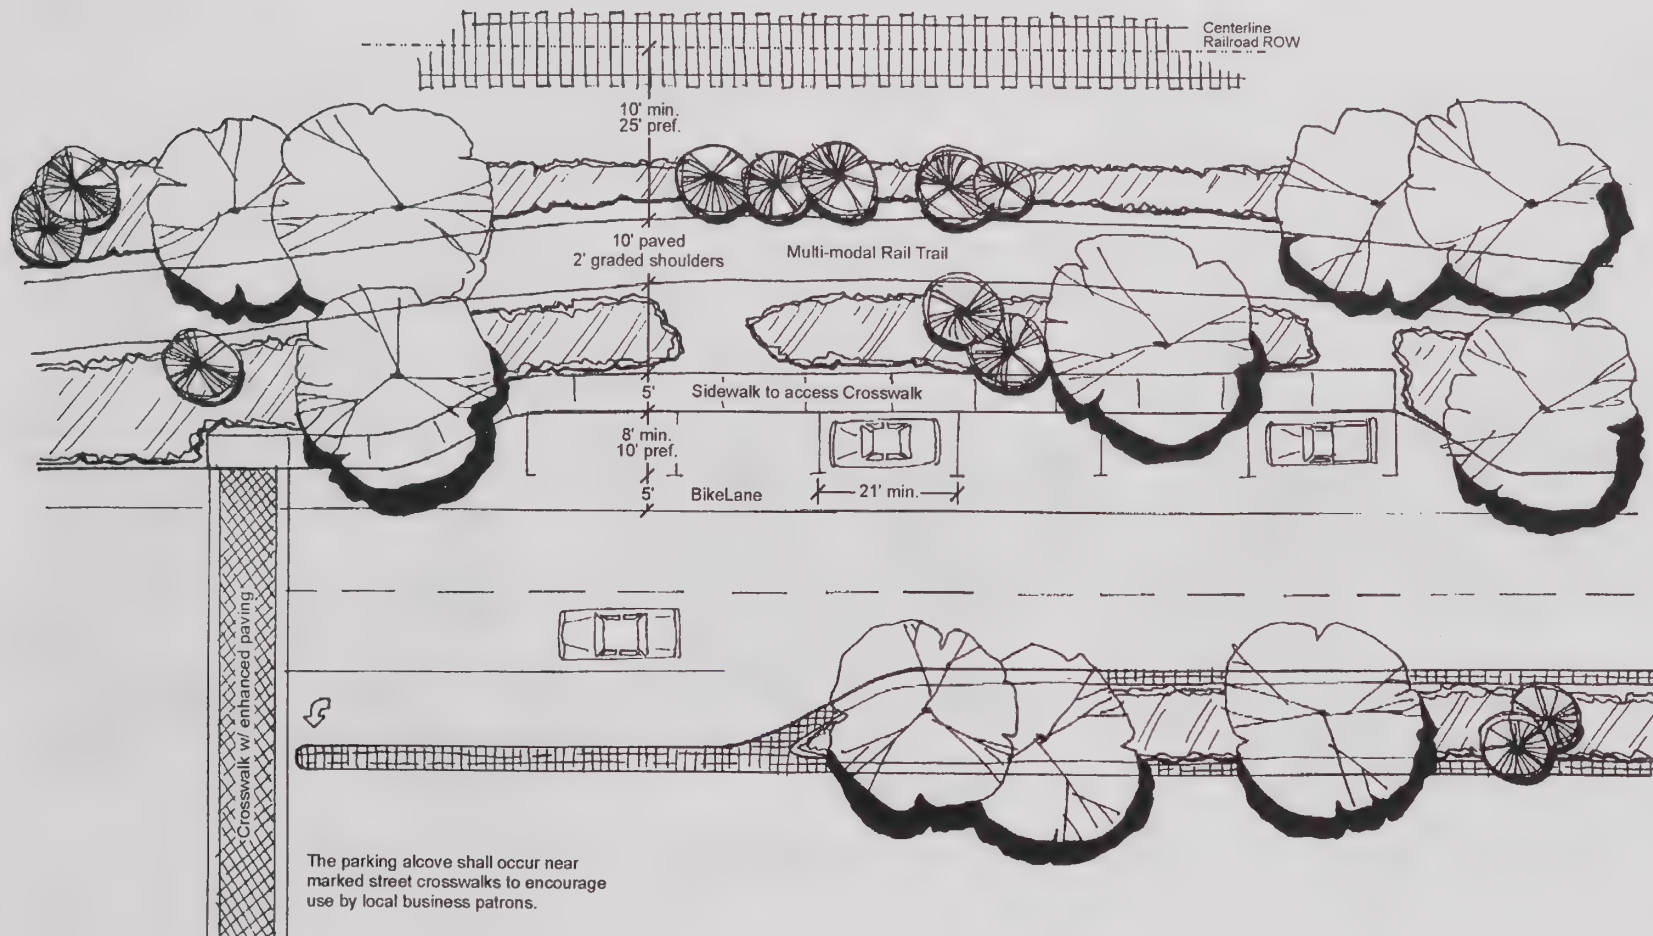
B: North Highway 101 and North Vulcan Avenue - Typical Cross-Section
